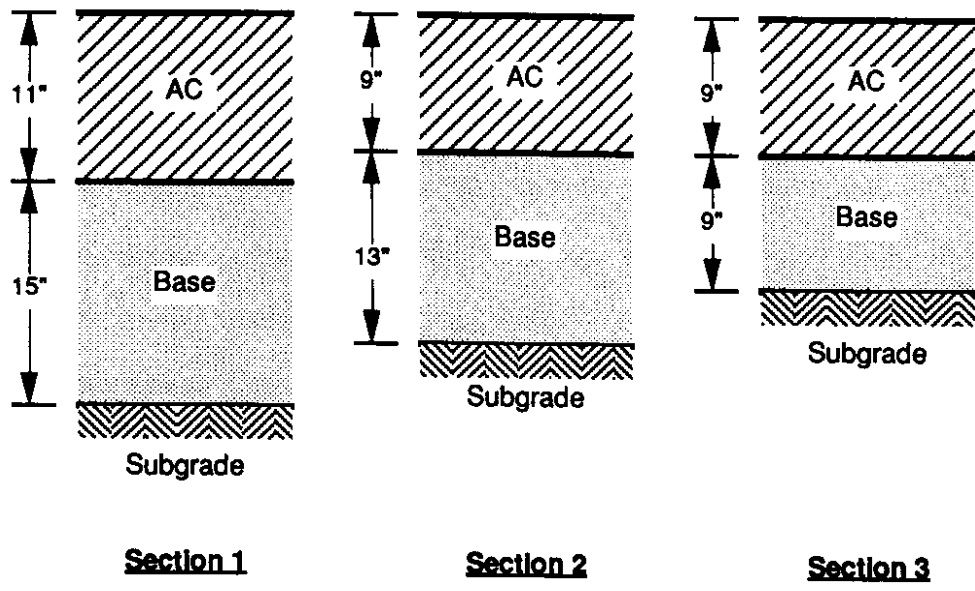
Subsurface Conditions at Excavated Sections, Sidney Road Overcrossing
